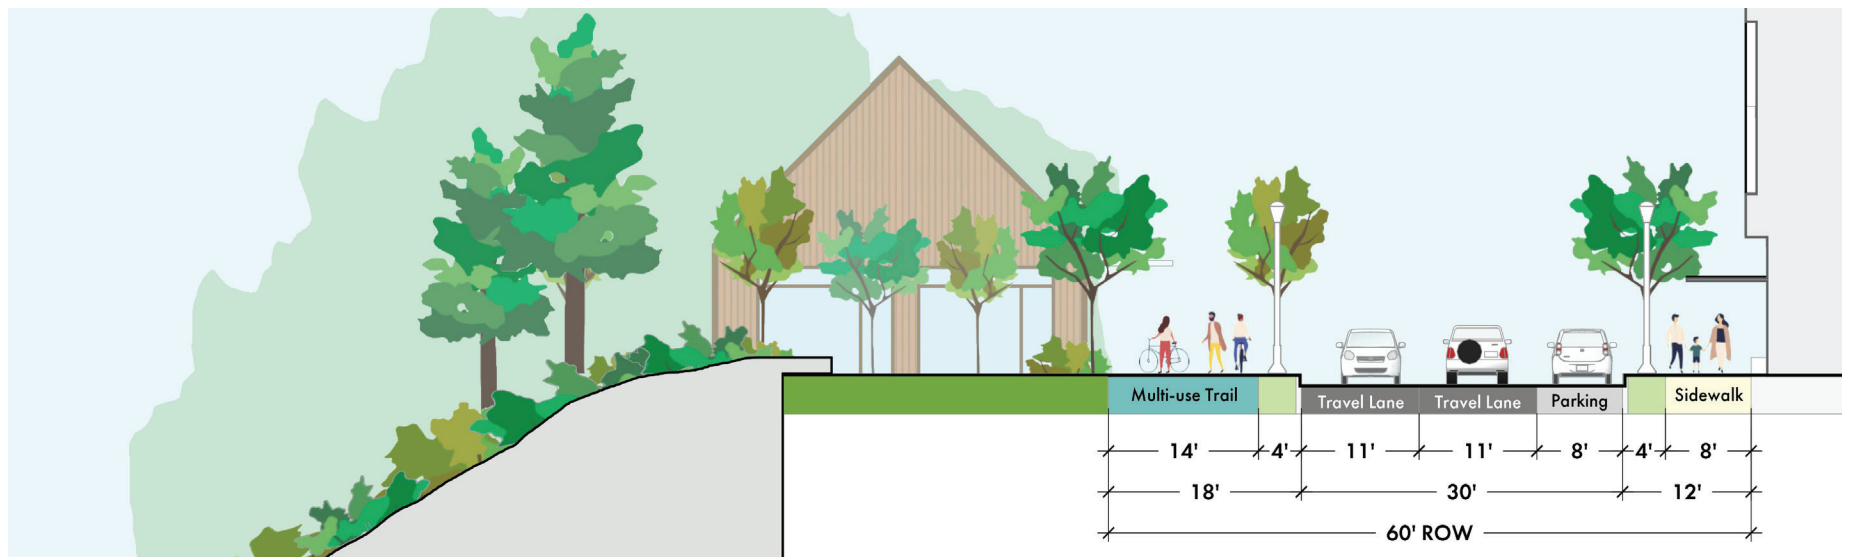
Proposed River Street w/Multi-Use Trail Section
